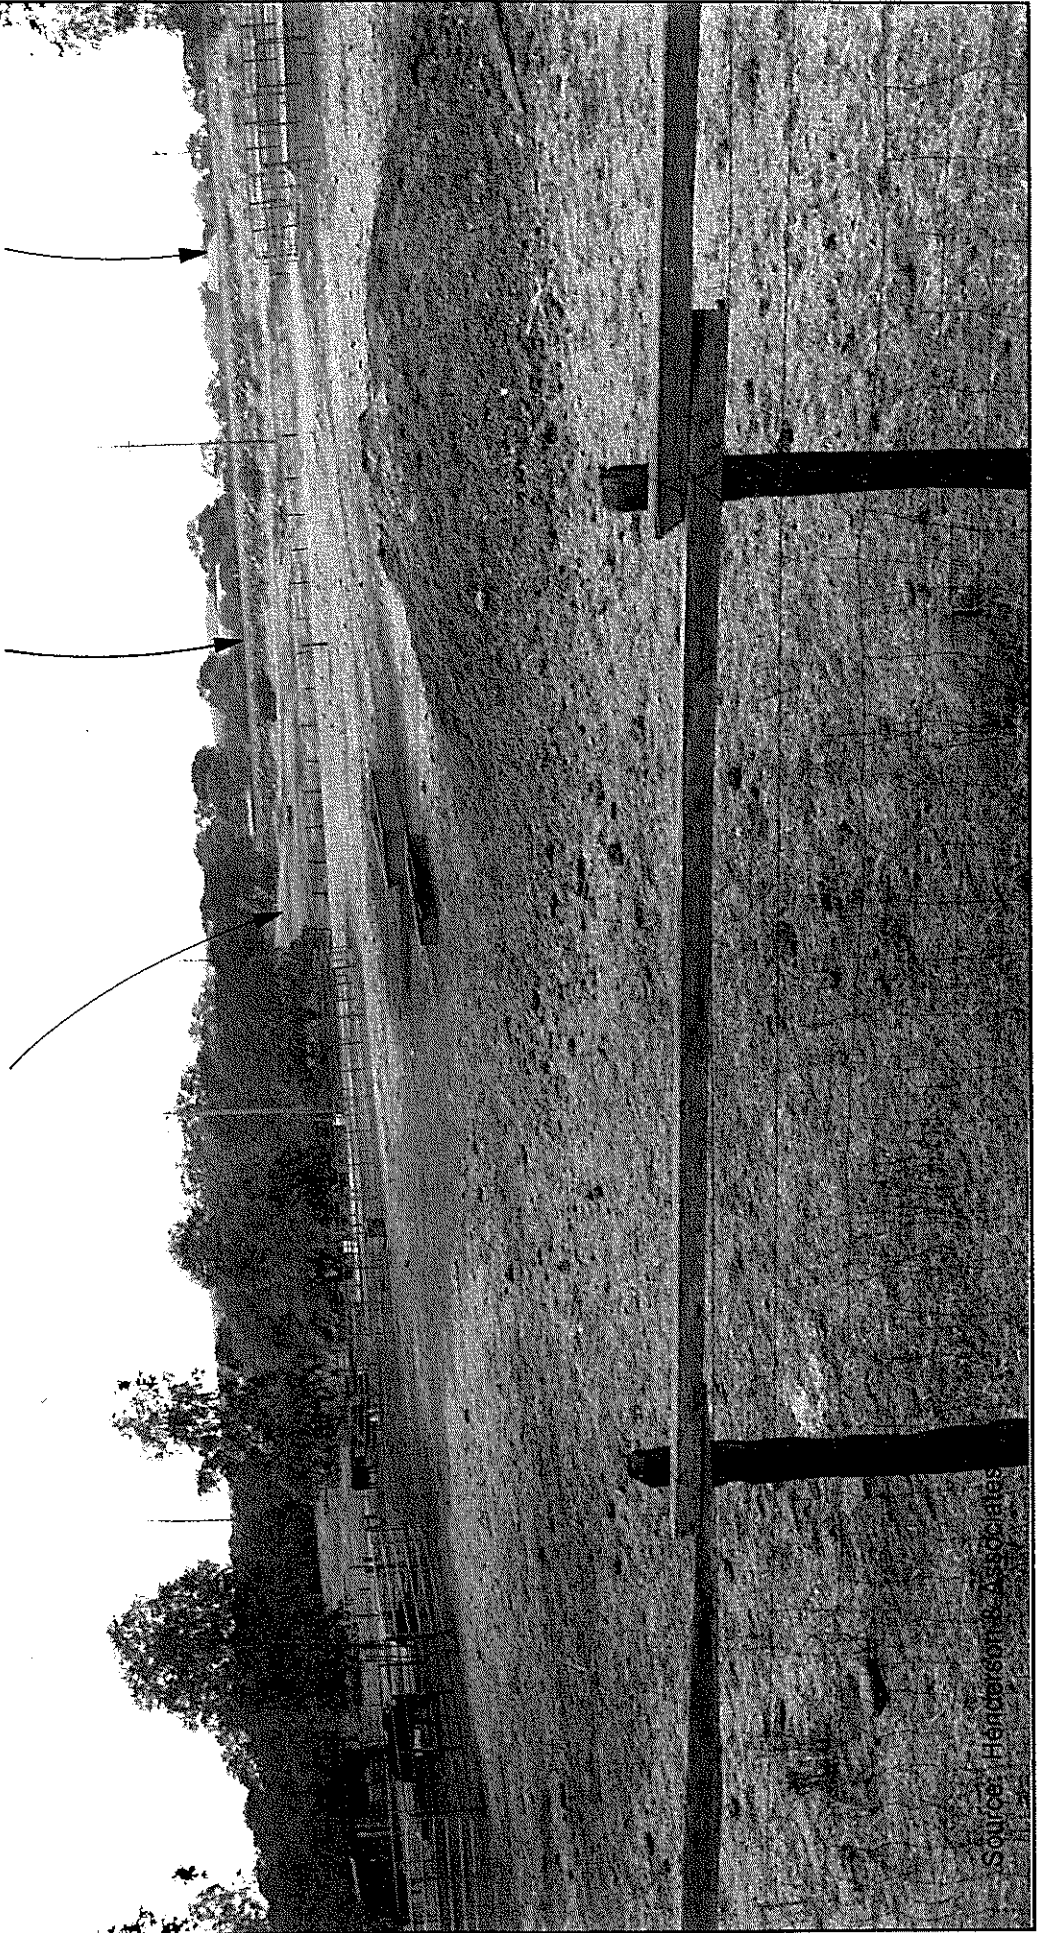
VIEW OF UNDERCROSSING FROM PHOTO LOCATION #3
